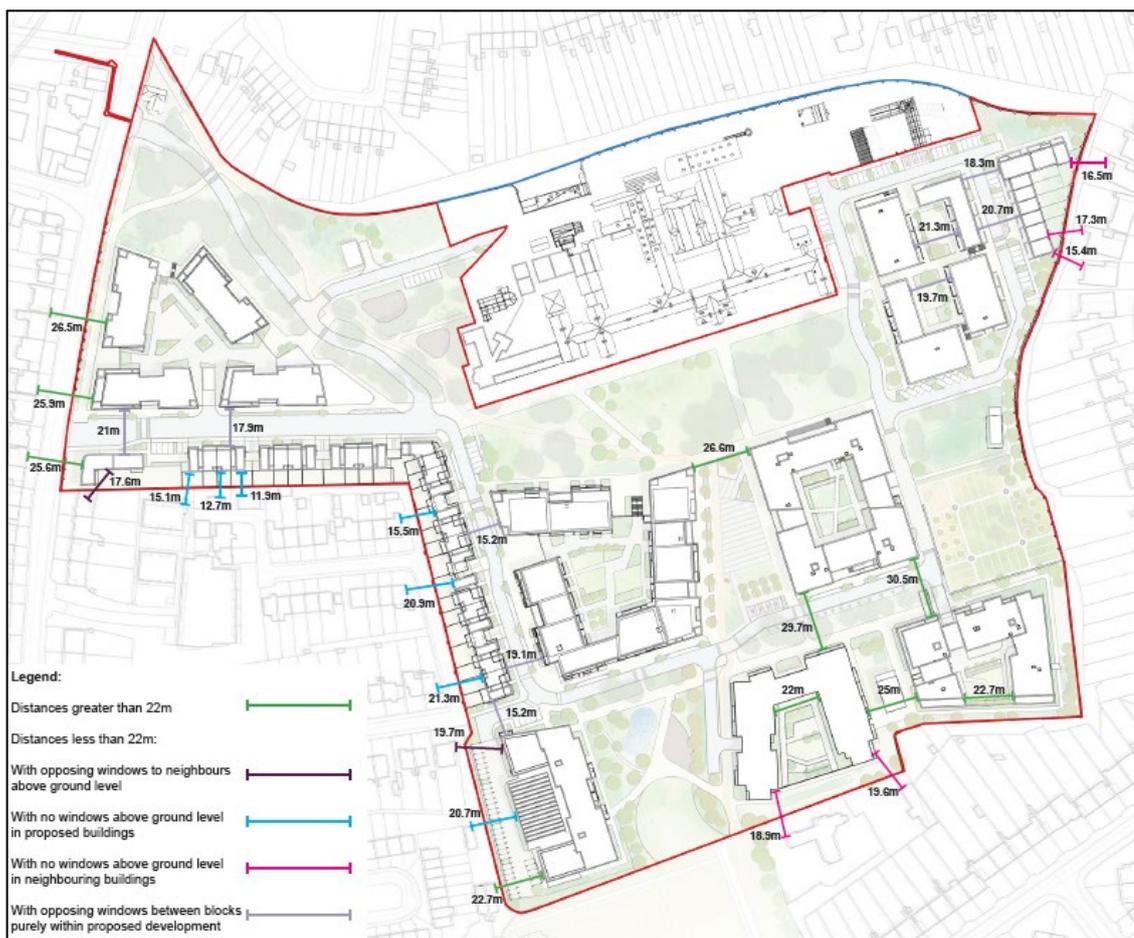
Illustrative site layout plan showing separation distances between the proposed buildings within the development and in respect of neighbouring buildings.
